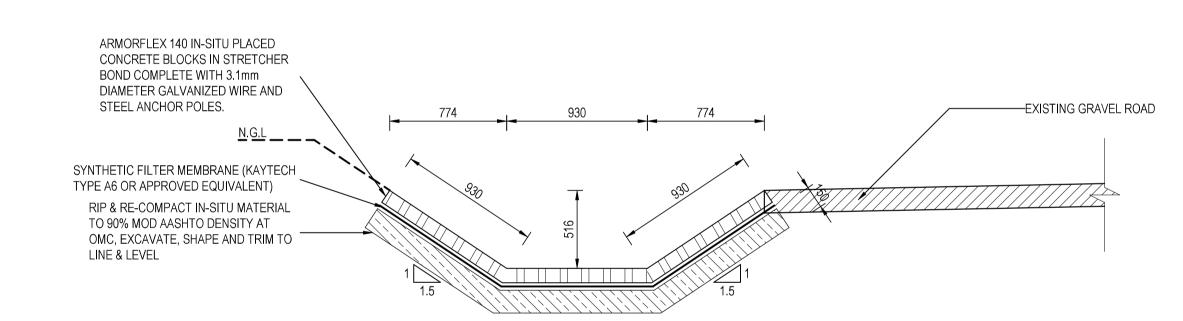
DETAIL A: TRAPEZOIDAL CHANNEL -GRAVEL OPEN DRAIN
